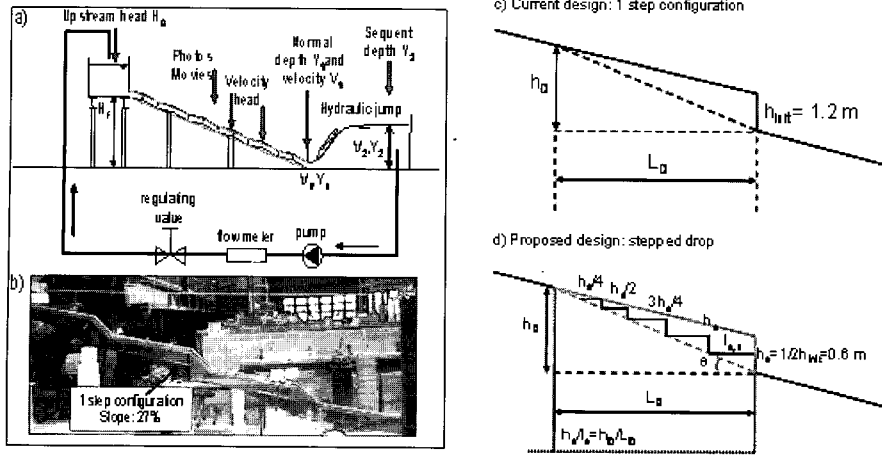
a) Definition sketch of stair-step culvert, constant head reservoir upstream and hydraulic jump downstream; b) Photo showing the geometry of the invert and the roof; c) current design of sudden step; d) new proposed design with stepped drop.
